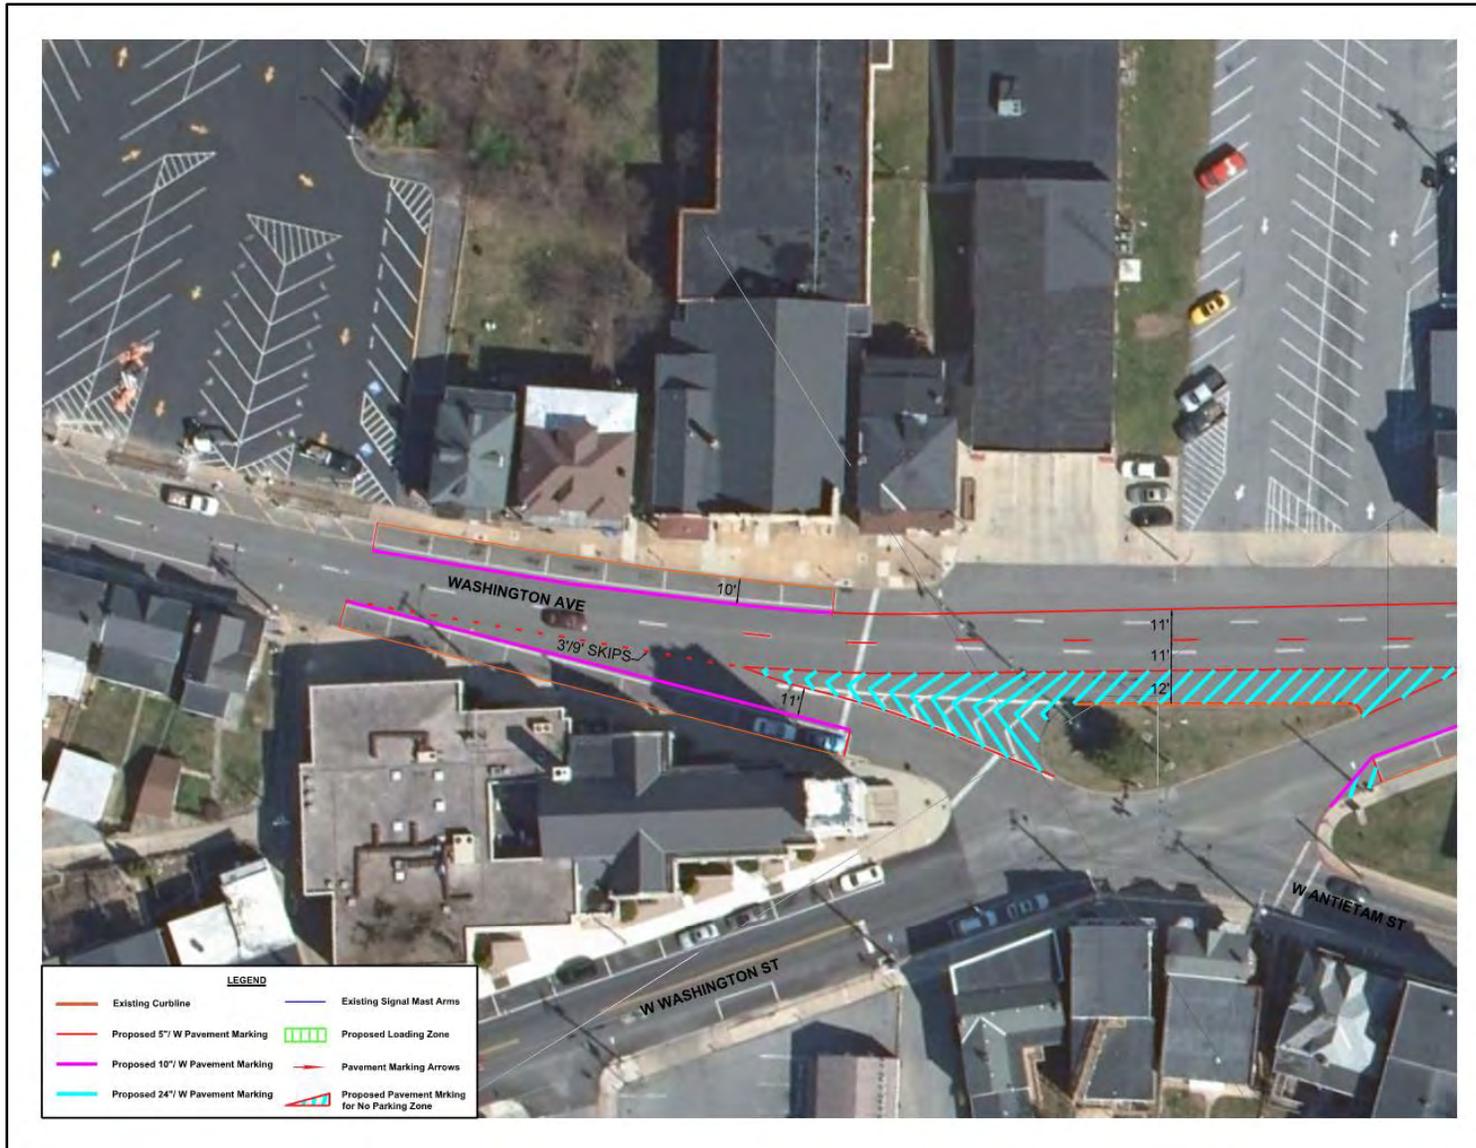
Pavement Marking Recommendations east of Washington Ave/Antietam St Intersection
